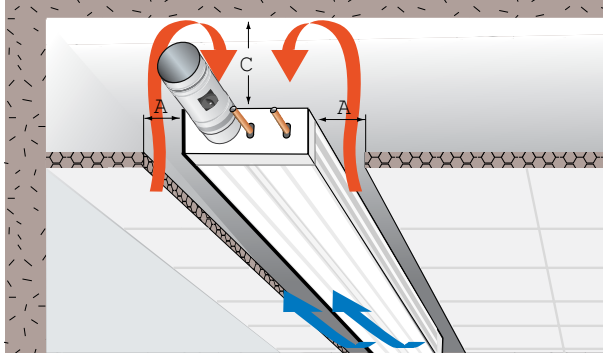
Installation dimensions when the room air reaches Podium from both sides.
